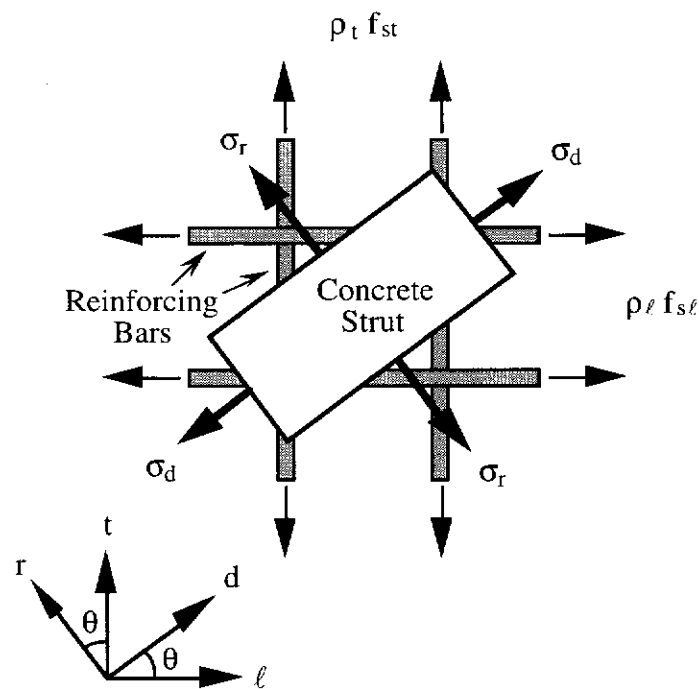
Reinforced Concrete Element for Stress Analysis
